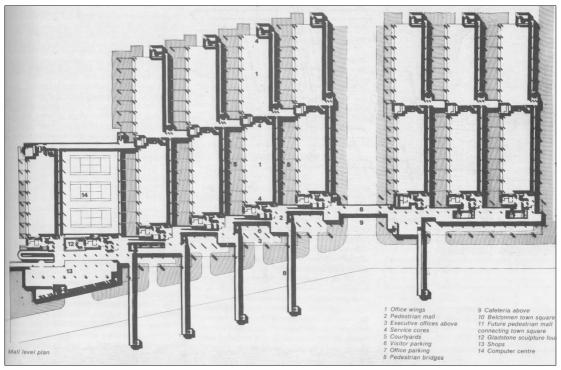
Plan of Cameron Offices, Canberra. Architect John Andrews.
